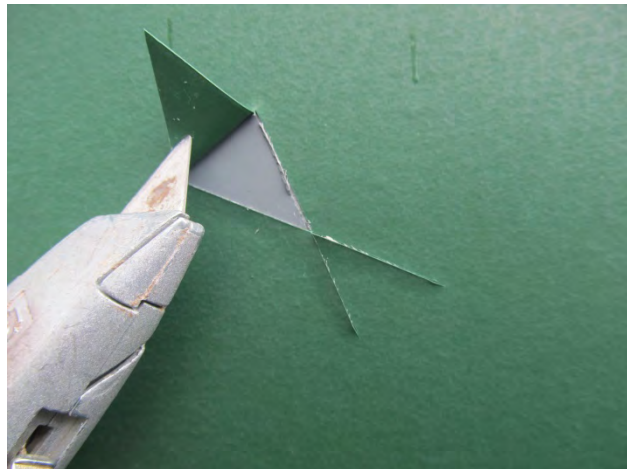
shows the results of an adhesion test conducted on the siding at the east end of the building. Adhesion was poor (ASTM D6677: 0).
